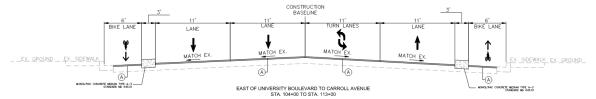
Typical One-Way Separated Bike Lane Section (Facing East)
